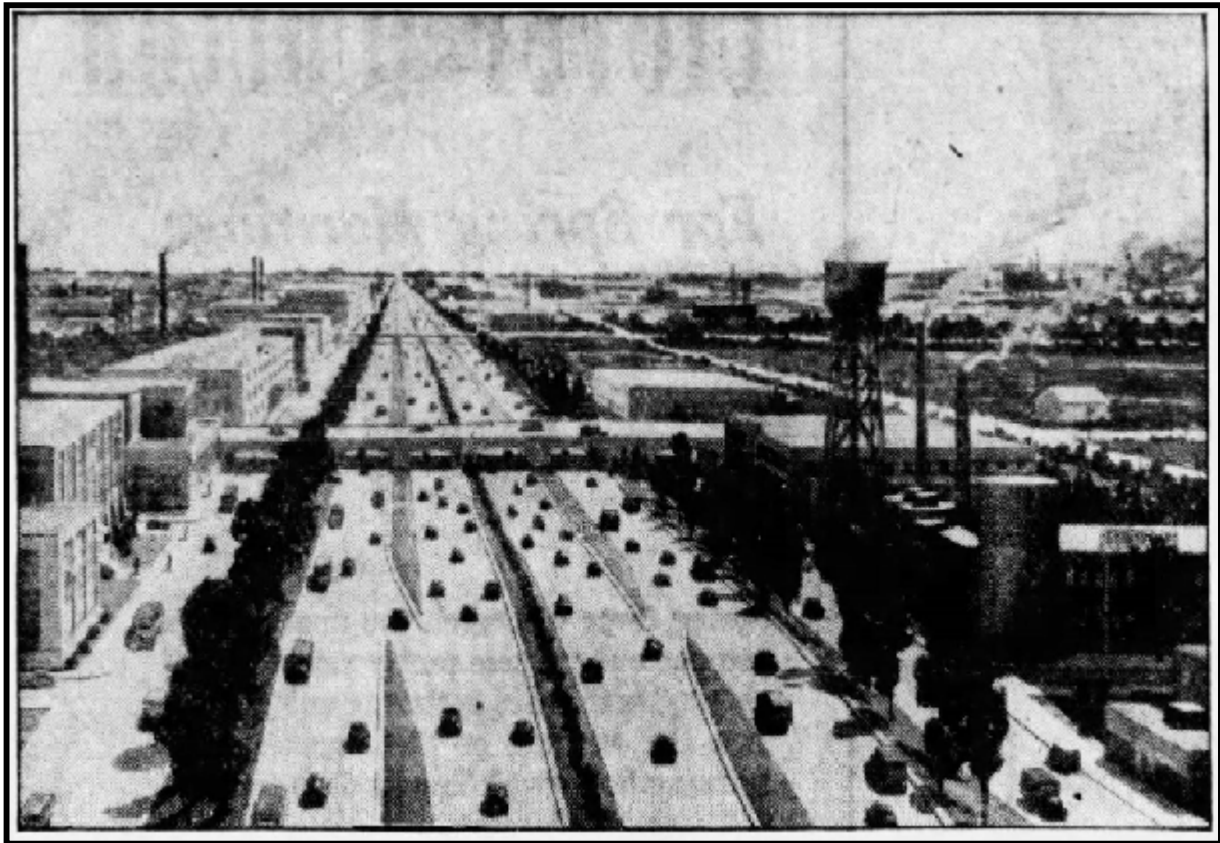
1941 newspaper rendering of the New Jersey section of the proposed Boston-Washington superhighway (Asbury Park Press, 17 March 1941: 10).
